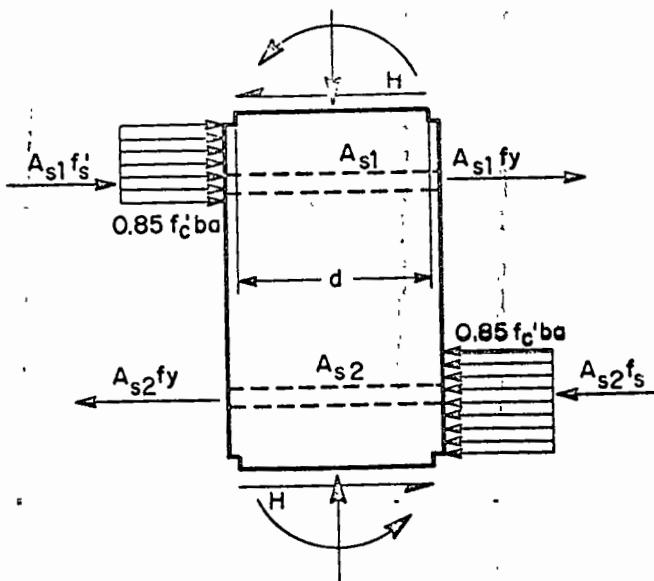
Horizontal shearing forces acting on a connection under seismic loading
